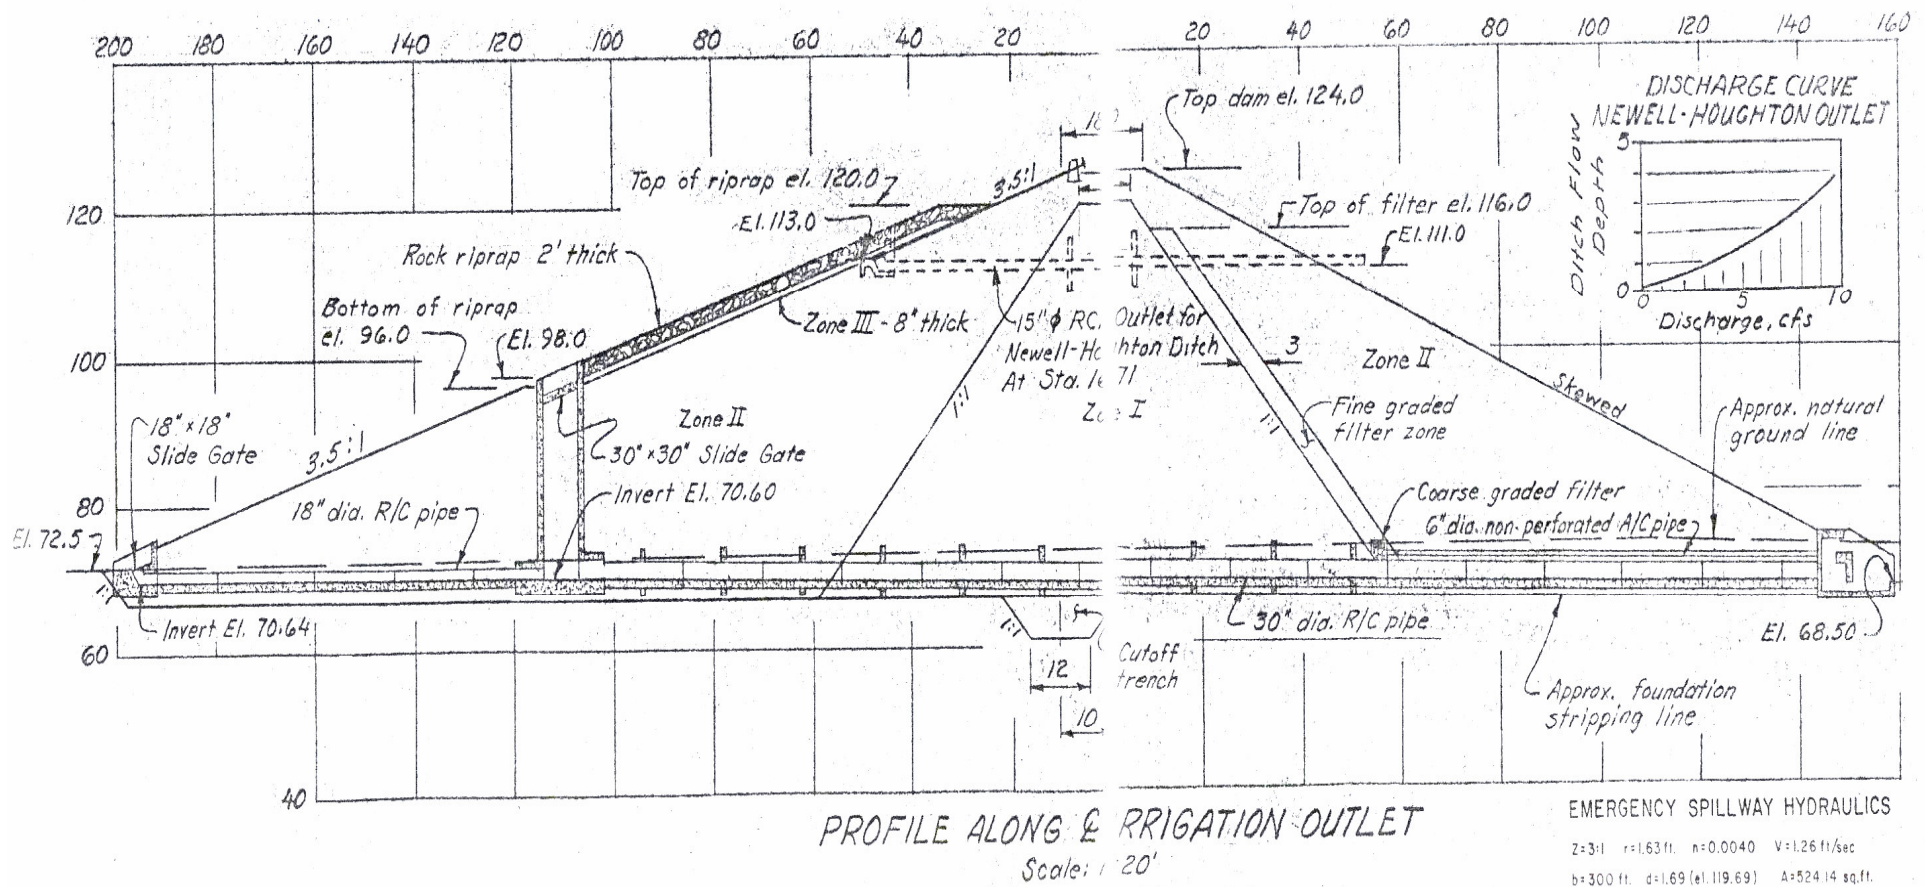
provides the Wyoming State Engineer's Office (SEO) permit application Toltec Reservoir dam cross section.
